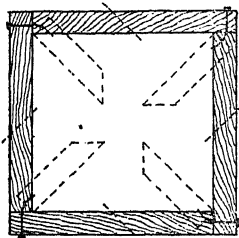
Method of Constructing Wooden Bolt Casing.
